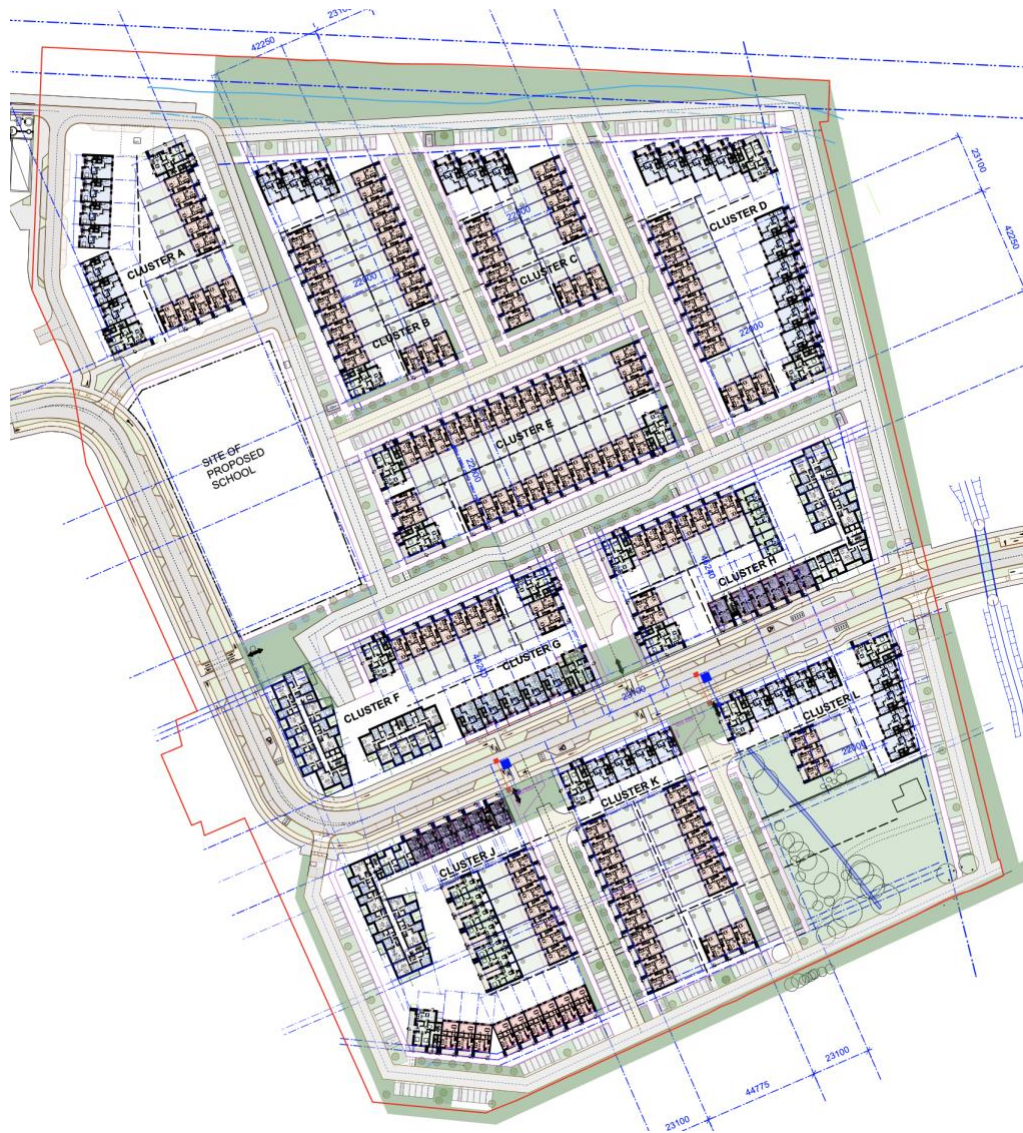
Site Layout Plan (Site 4) at Section 247 meeting held on the 2 July 2024 with application areas outlined in red
